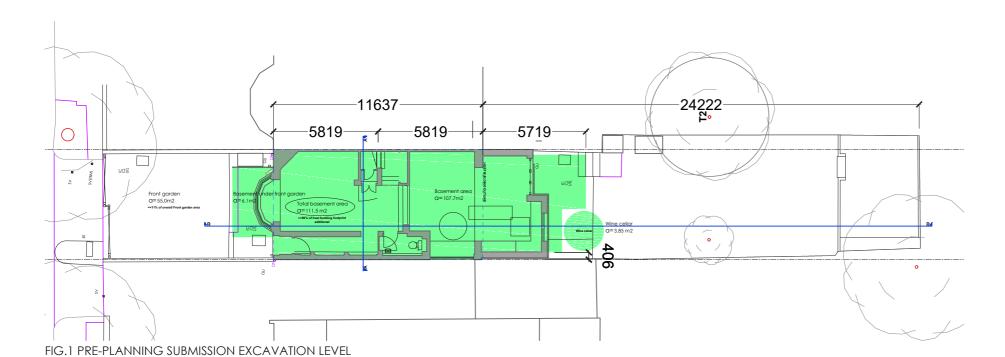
PRE-PLANNING SUBMISSION EXCAVATION LEVEL
